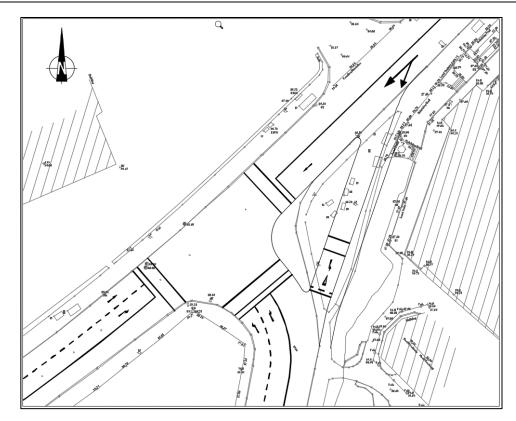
Alternative Signalised Junction Layout at Tuam Road and Joyce's Road
